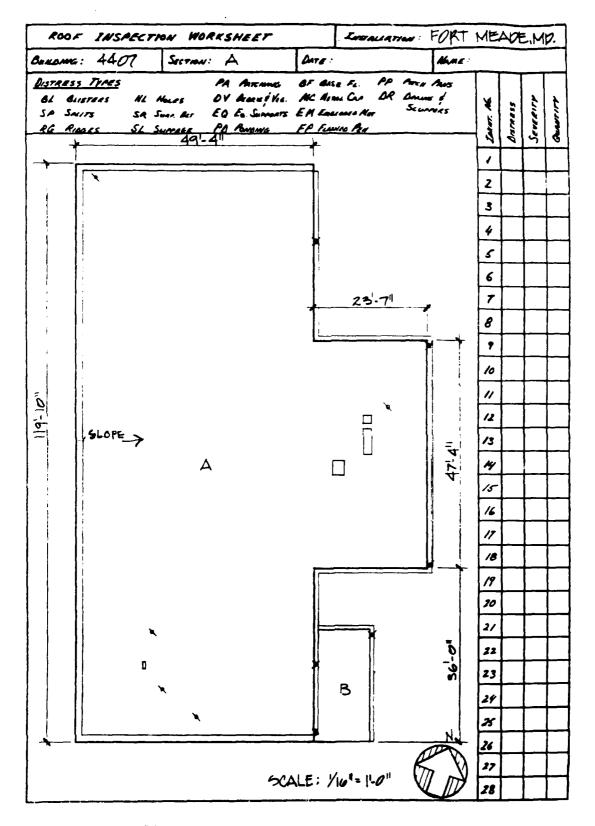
Roof Inspection Worksheet with roof plan.
